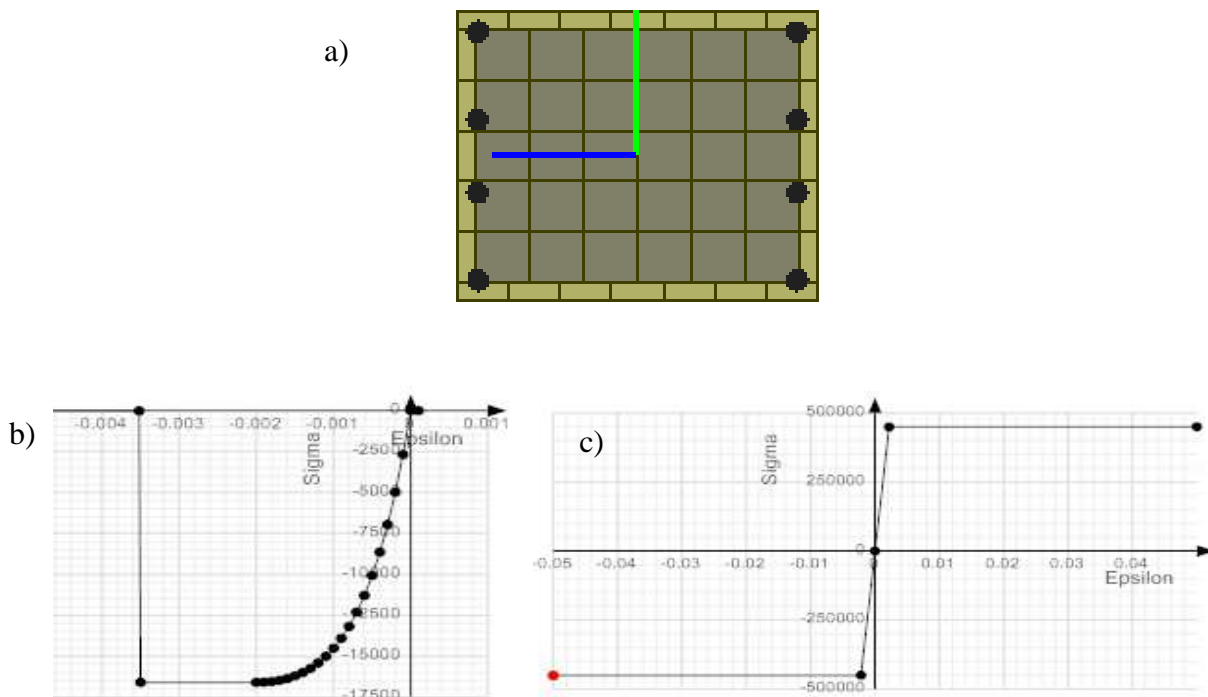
(a) Sample of cross-section discretization for the static non-linear analyses; a lighter color denotes unconfined concrete. Constitutive laws adopted for (b) concrete and (c) steel reinforcement.
